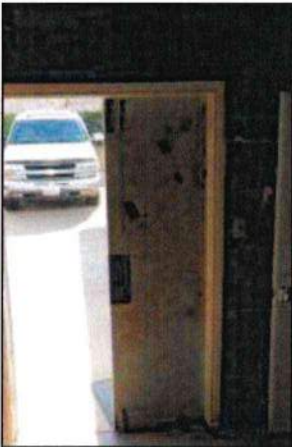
Fire Station #1 The door from the hose tower interior to the exterior is heavily rusted.
